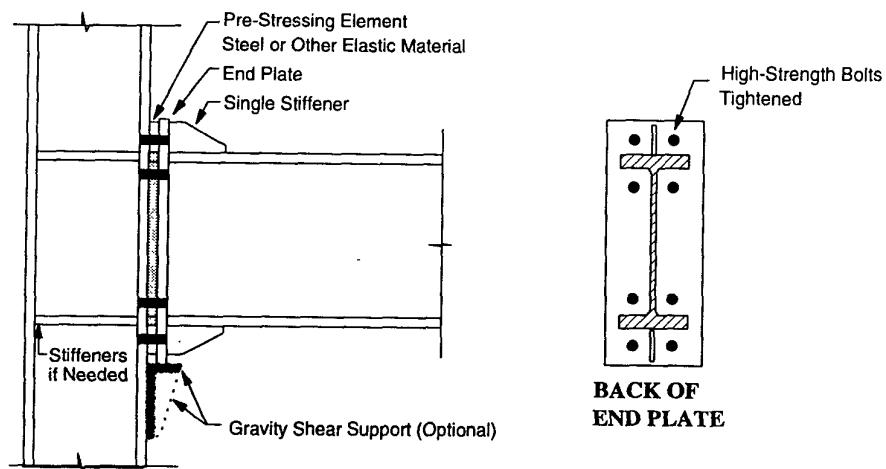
Prestressed End Plate Connections Proposed by Astaneh-Asl (1986c)
